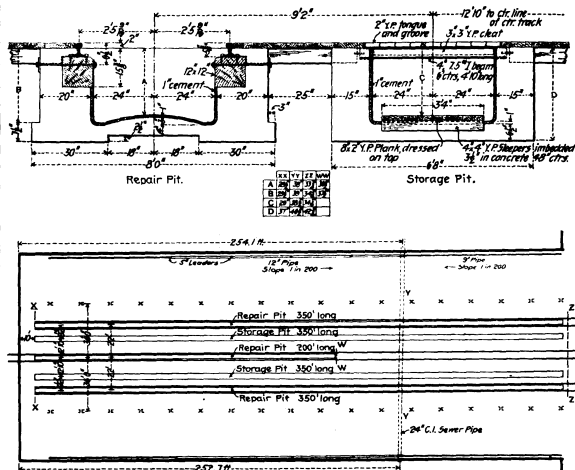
Plan and Sectional Elevations of Repair and Storage Pits—Michigan Central Shops, Jackson, Mich.
